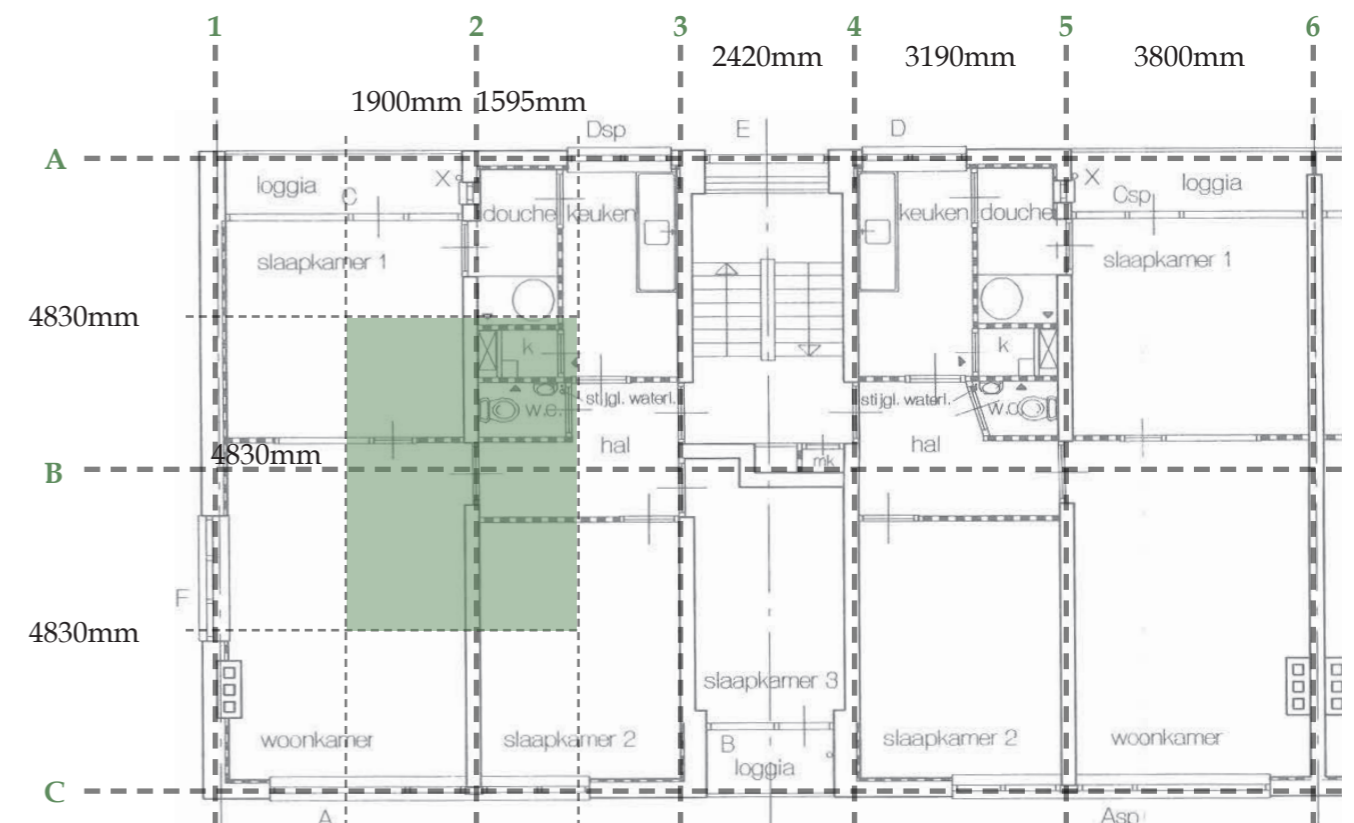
Pirandellostraat segment of building floor plan with floor area supporting on column B2 (TU Delft, n.d.)
